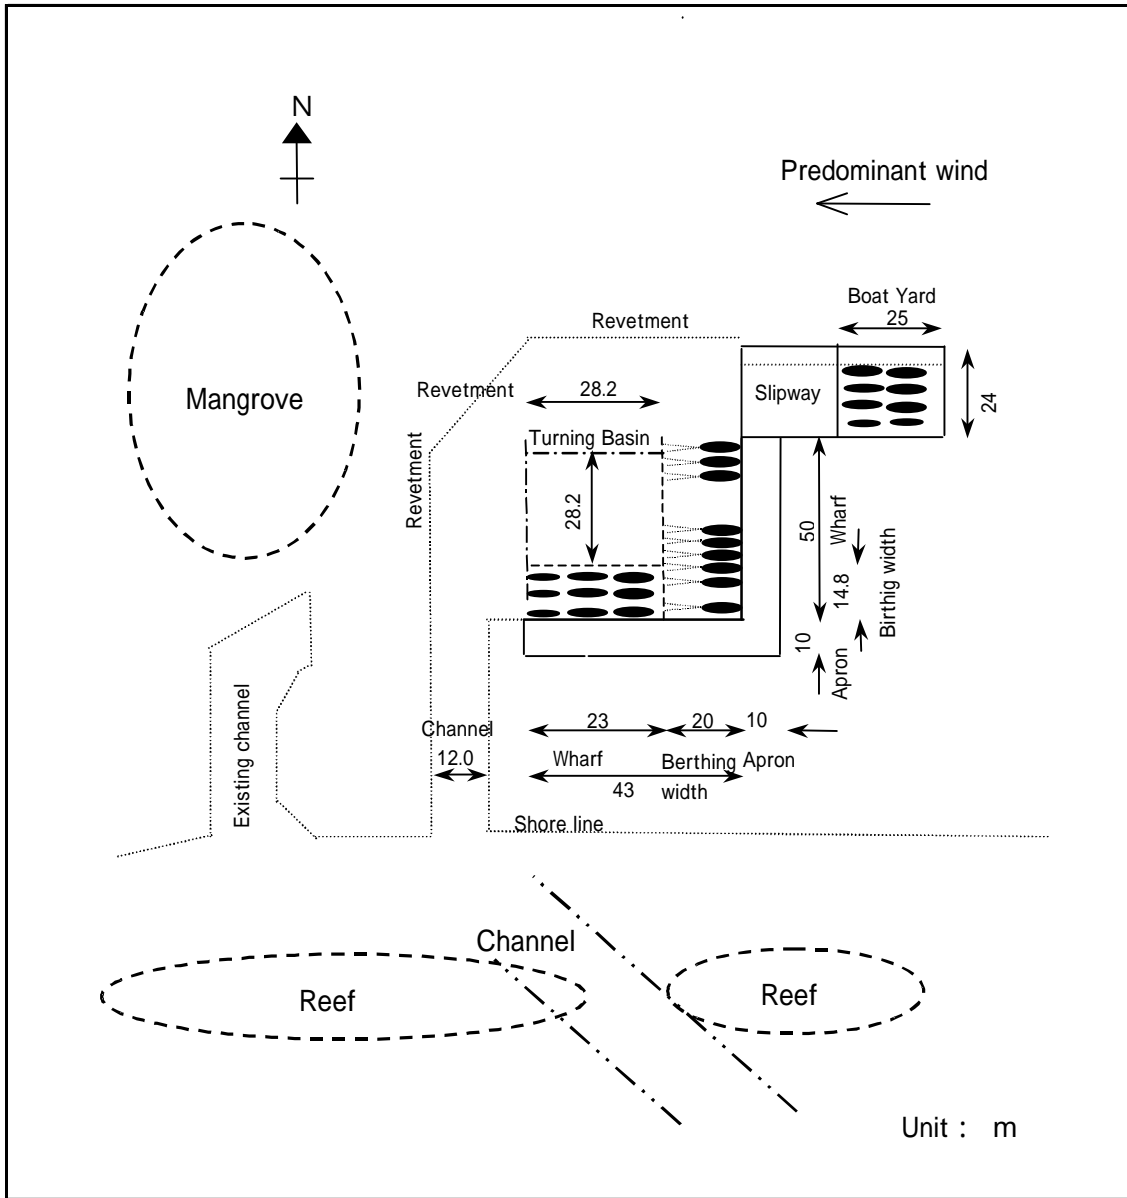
Schematic Layout Plan in Urlingts
